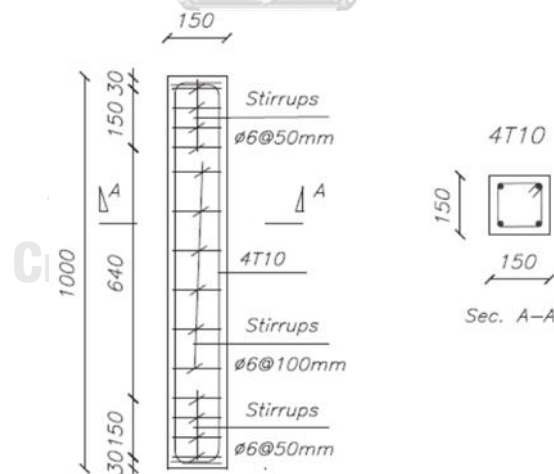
Reinforcement detail of concrete specimen (Tarabia and Albakry, 2014)
